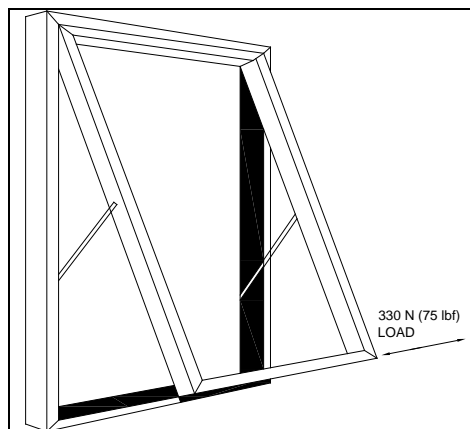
Top Hinged Inswing- Vent Lateral Racking Test
